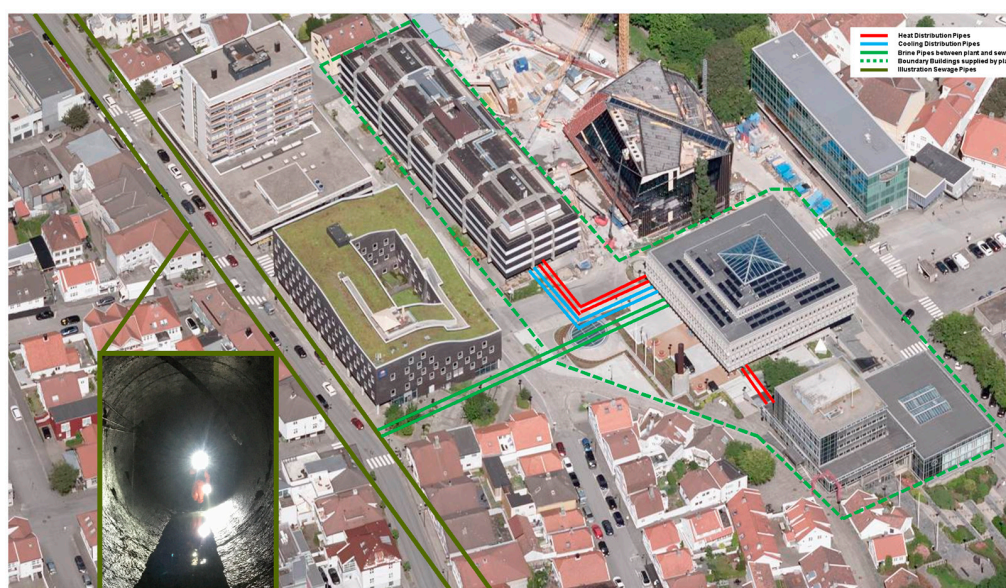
Thermal energy plant and surrounding buildings in relation to the wastewater tunnel.
